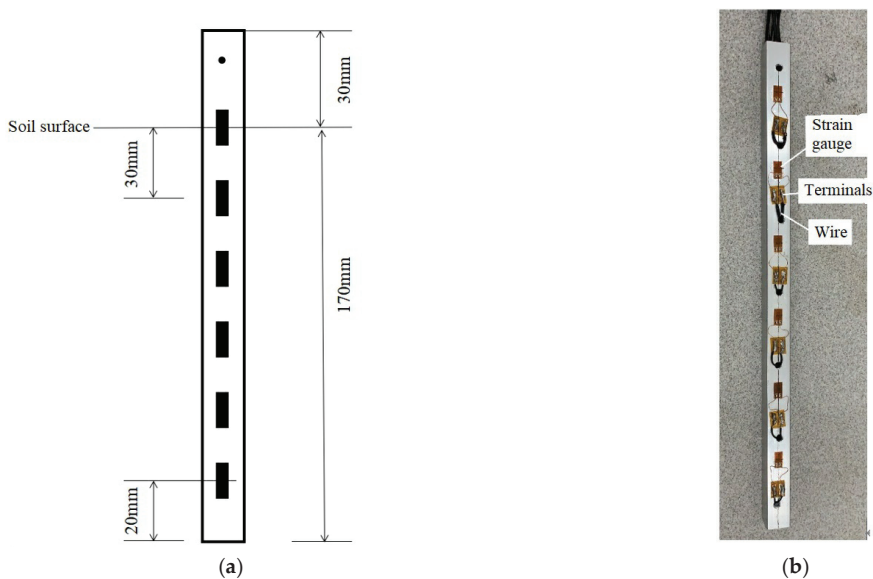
Model pile. (a) Layout distance of pile body strain gauge. (b) Model pile.
